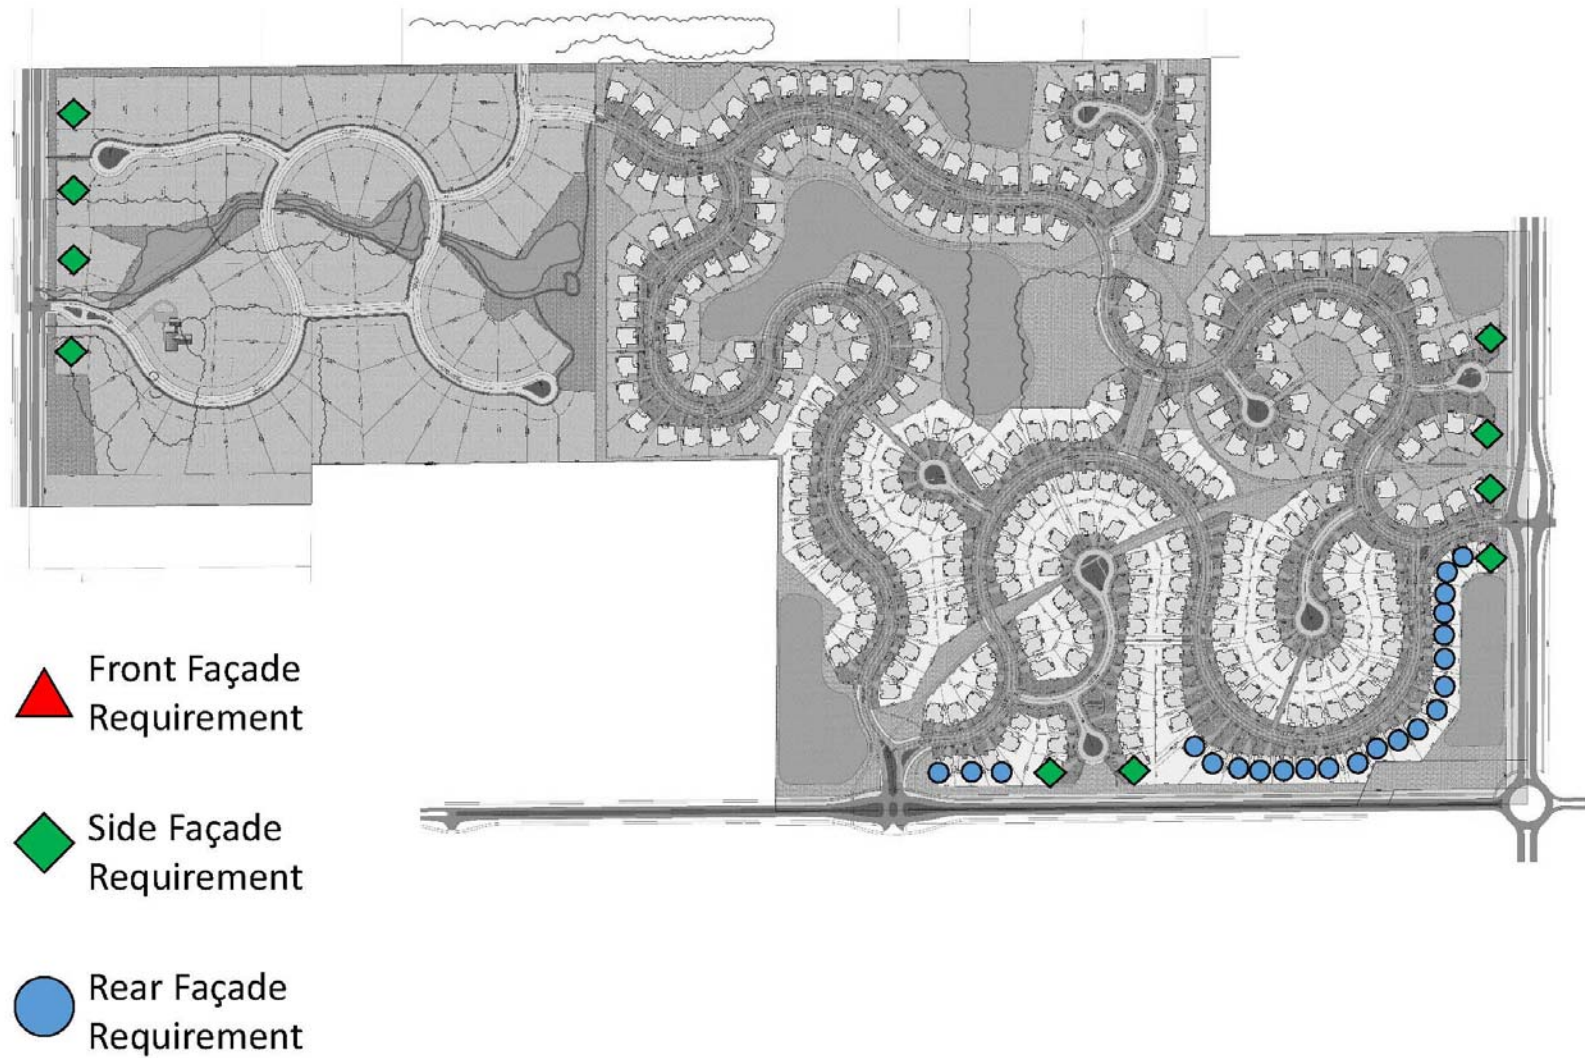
Perimeter Lots Subject to Architectural Standards
